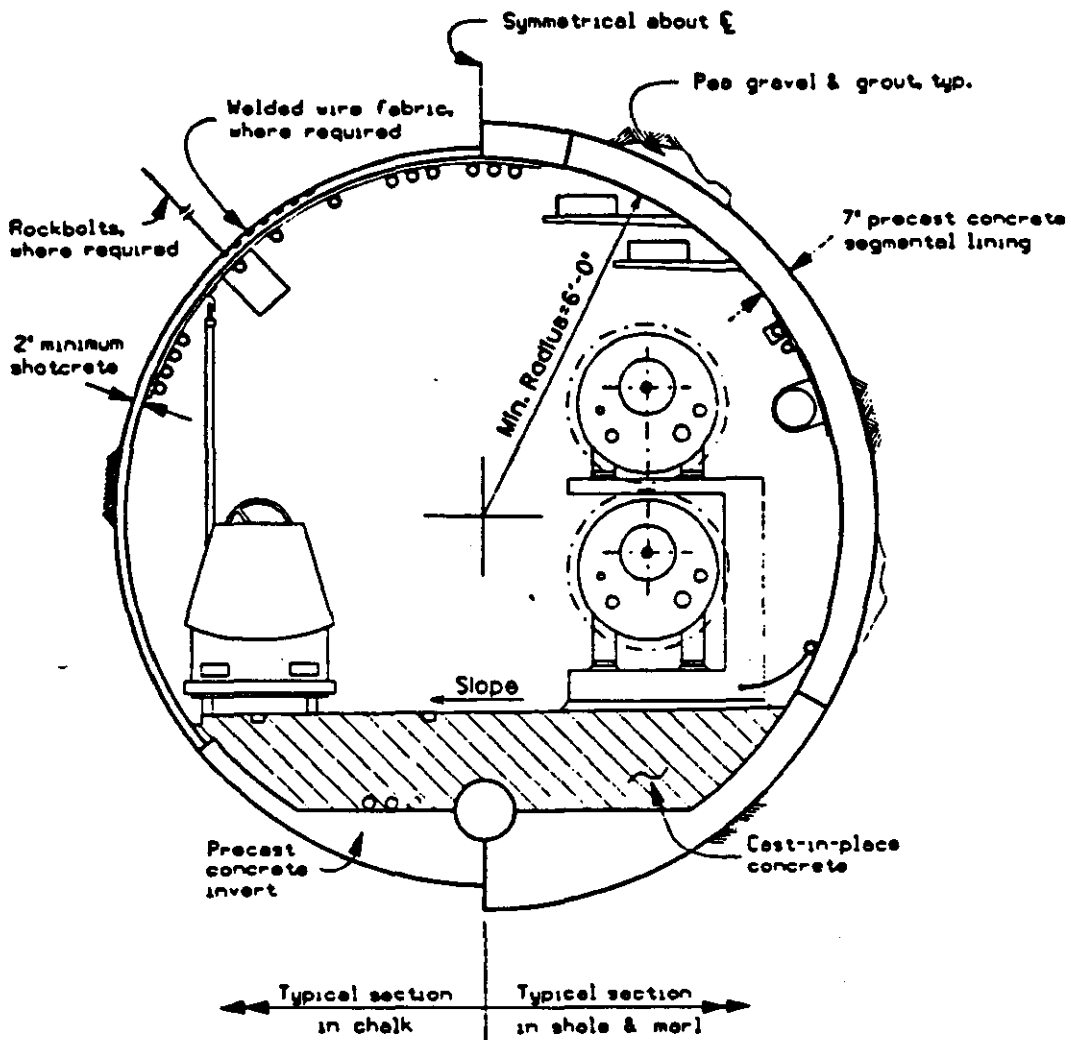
Cross section of the collider tunnel. Note that the tunnel-wall construction differs according to the local geological characteristics with the highly stable Austin chalk requiring a less rigid tunnel structure.
